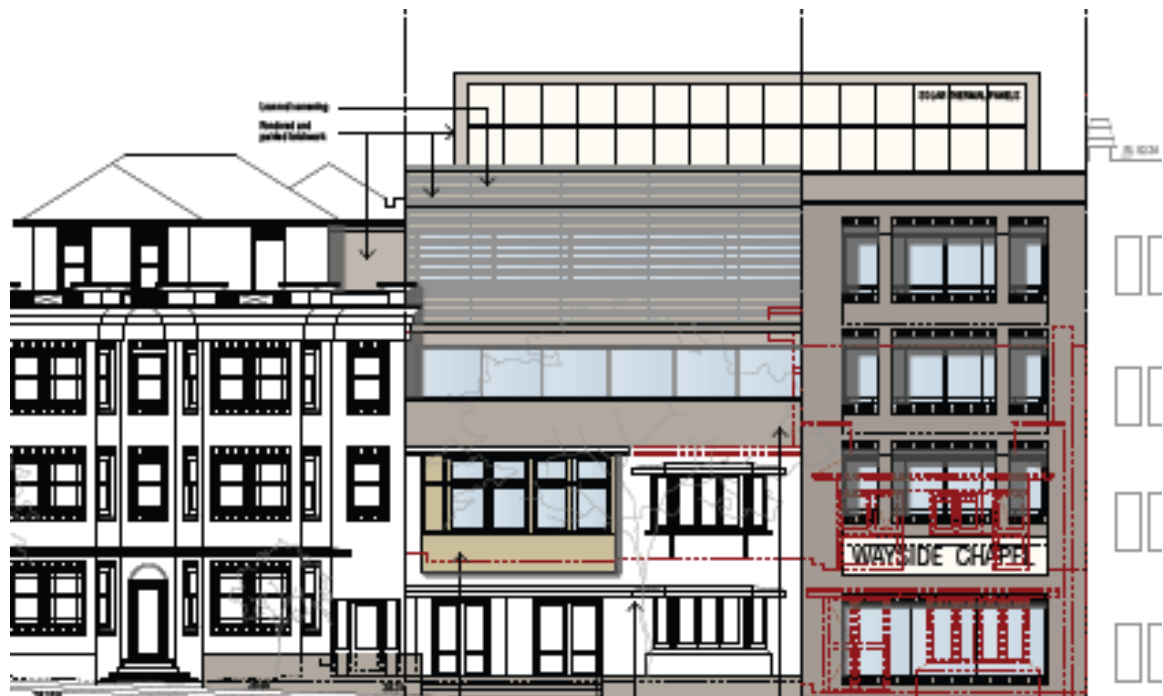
Original proposal with solar panels placed on the side of a raised triangular plant room.
